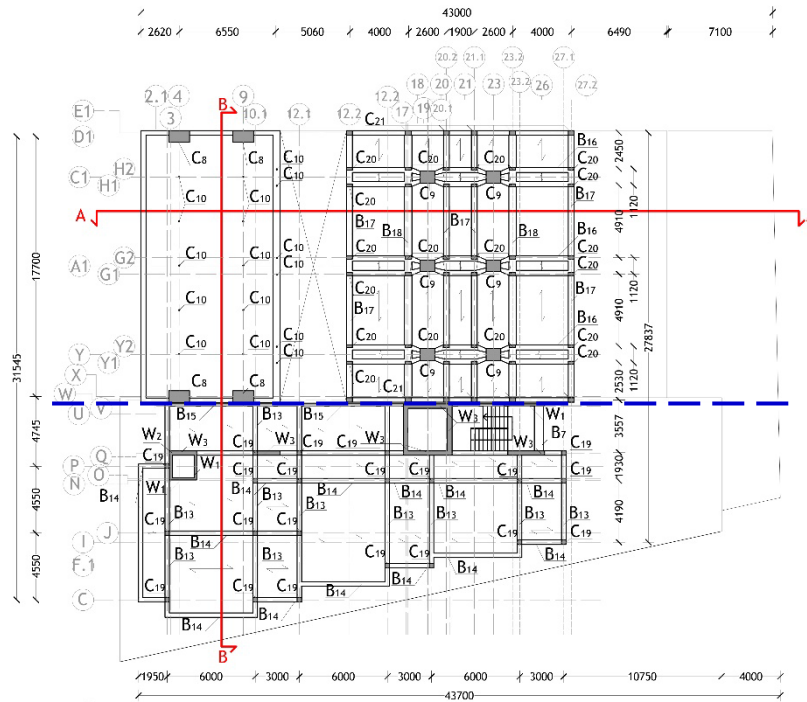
Structural plan of the first complete floor of the hotel (height 11.15 m from ground level)
